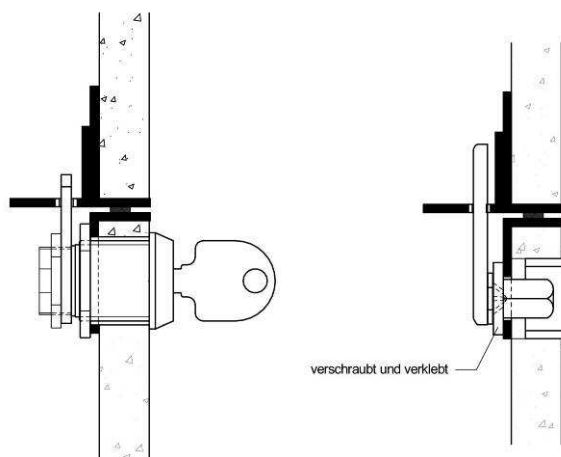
Drawing - surface-mounted cylinder cam lock and pin-fastener in panel with 12.5 mm GKBI
